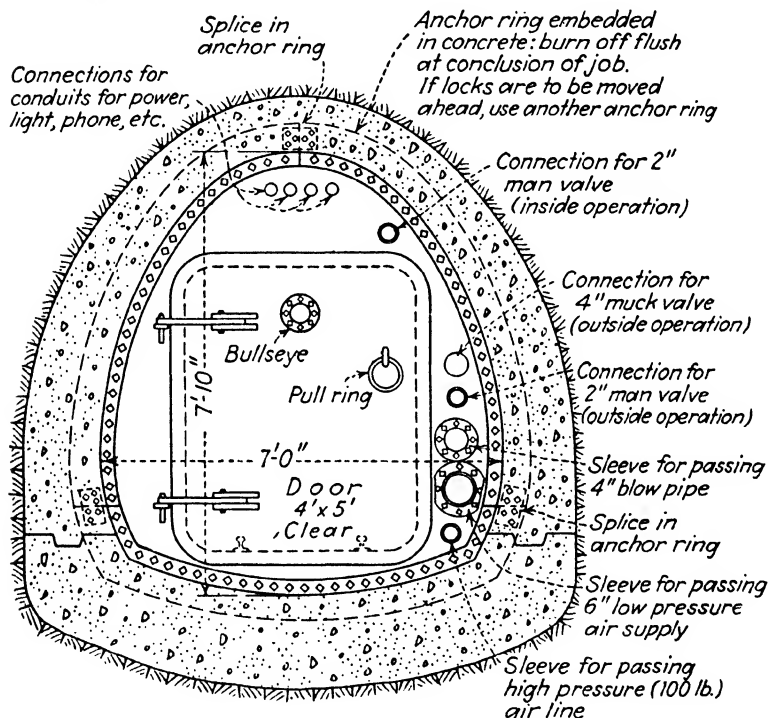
Bulkhead type of lock for small tunnels. Sleeves must be provided in the bulkhead for passing all pipes required in the tunnel.
